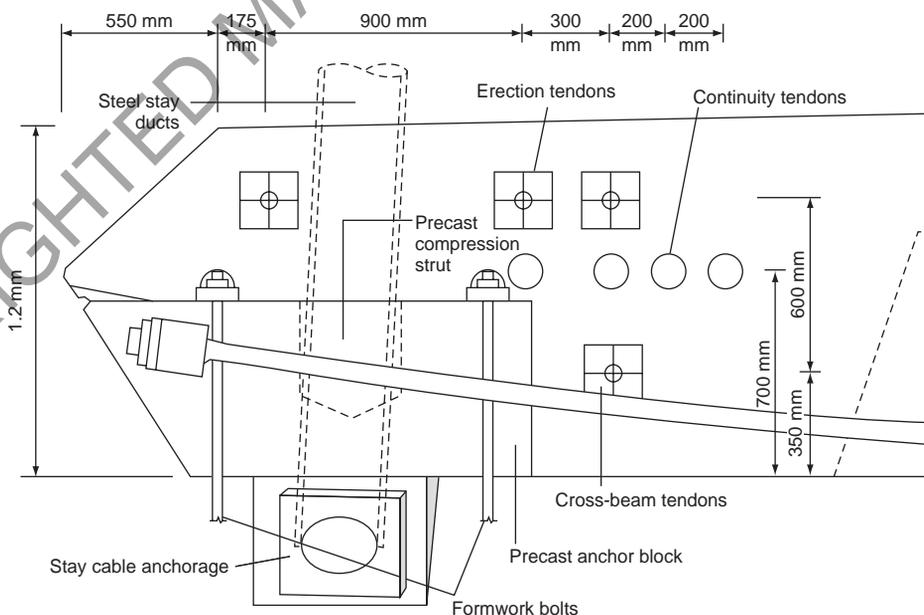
Precast anchorage and edge beam – Helgeland Bridge
